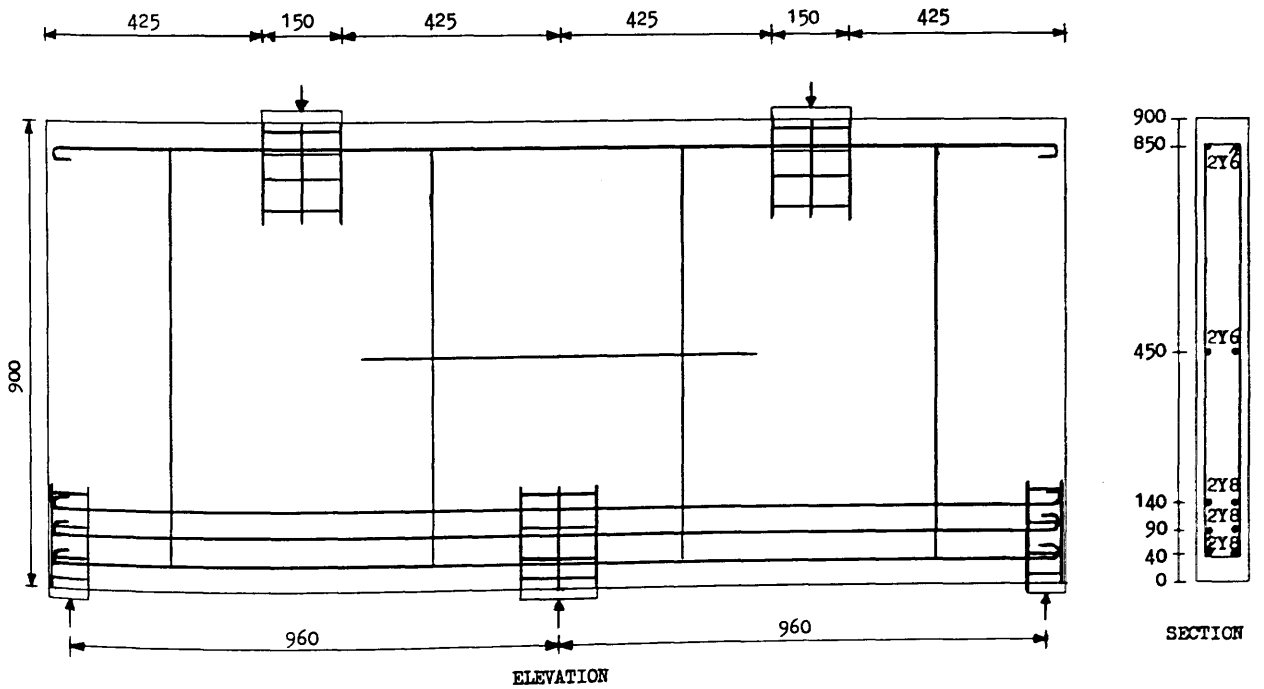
Dimensions and reinforcing details of girder TRGRAS3
